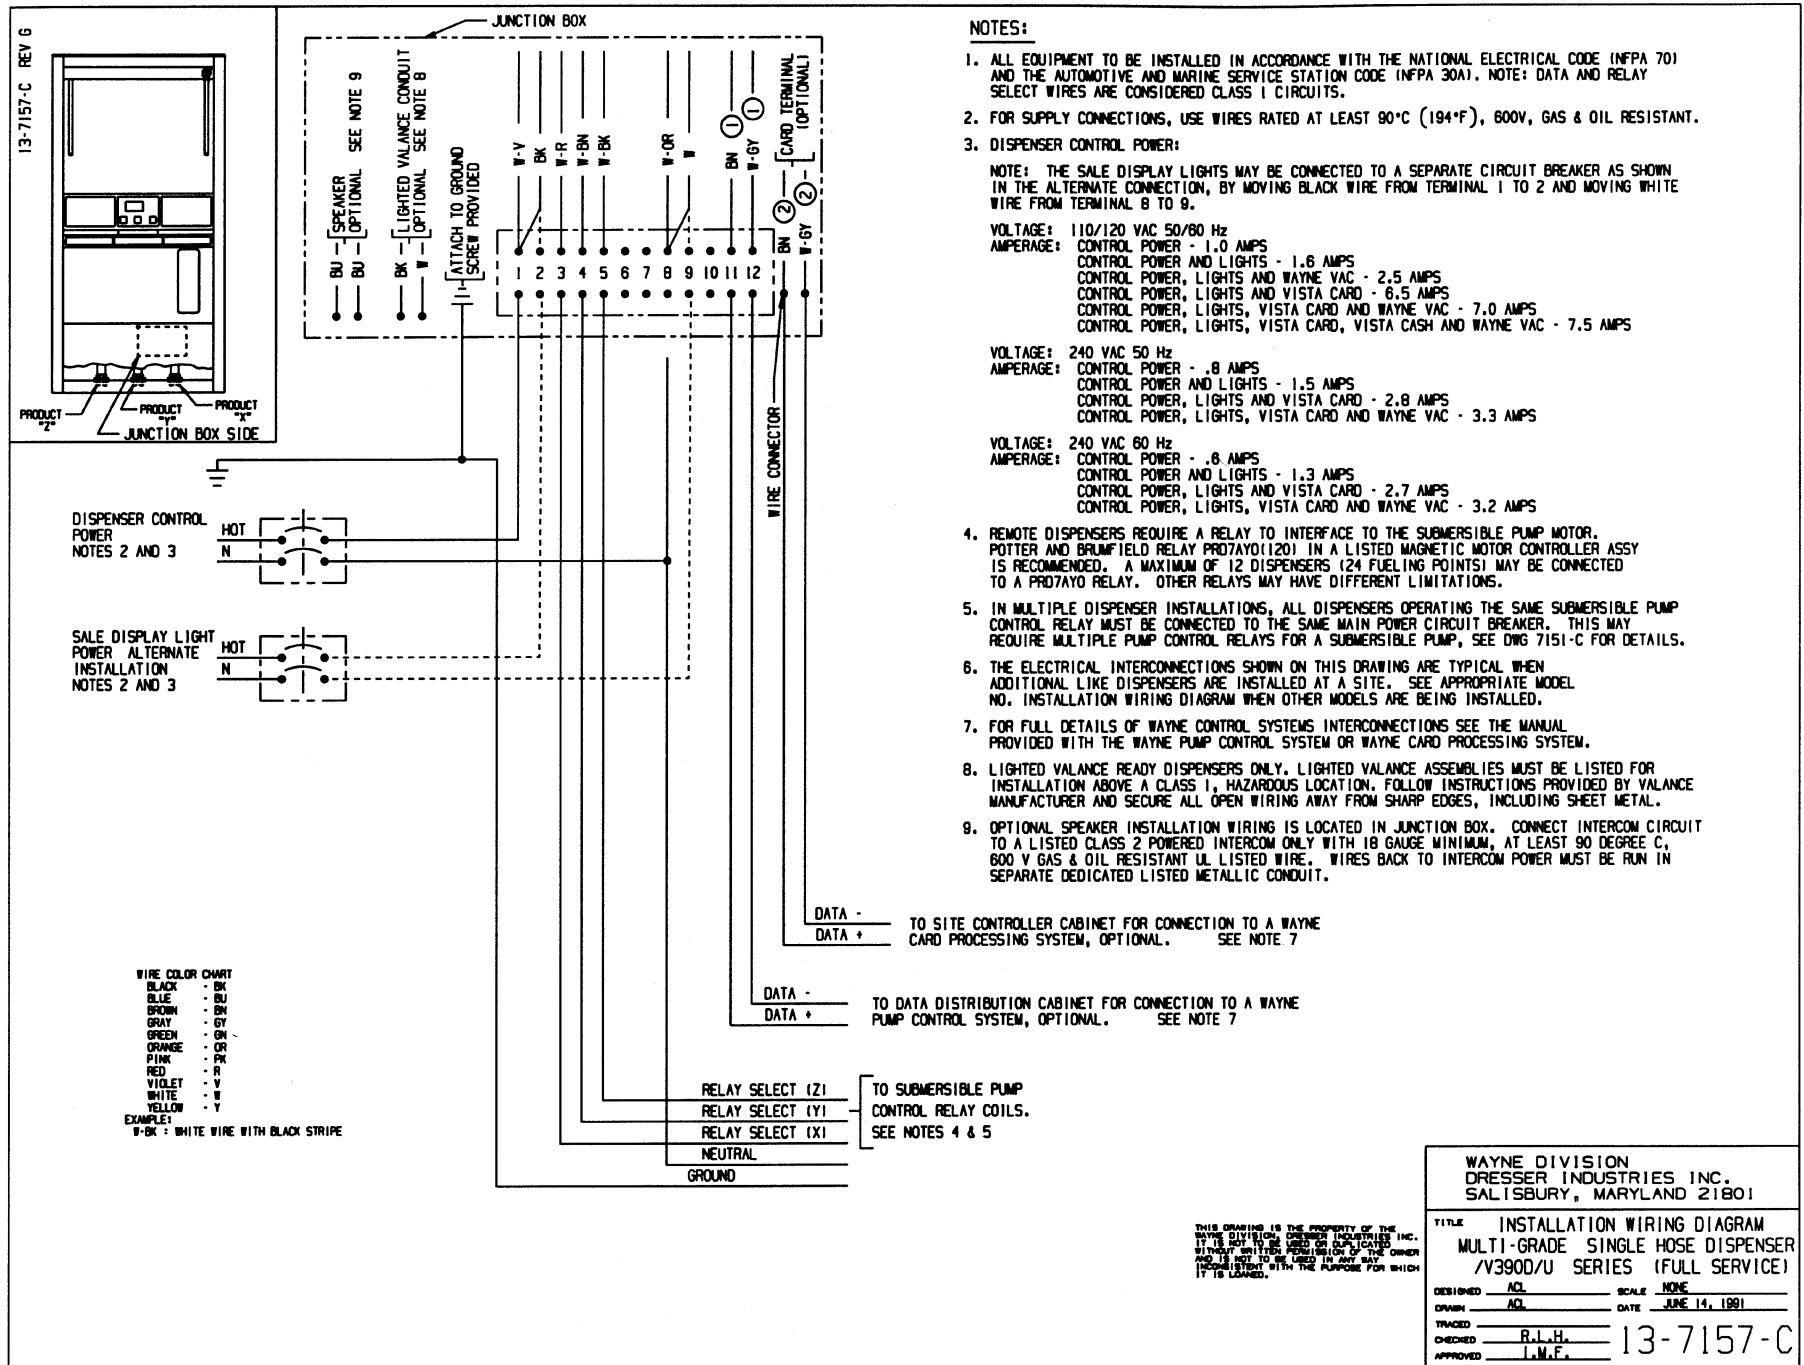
13-7157-C Installation Wiring - 3/V390D/U (Remote)
